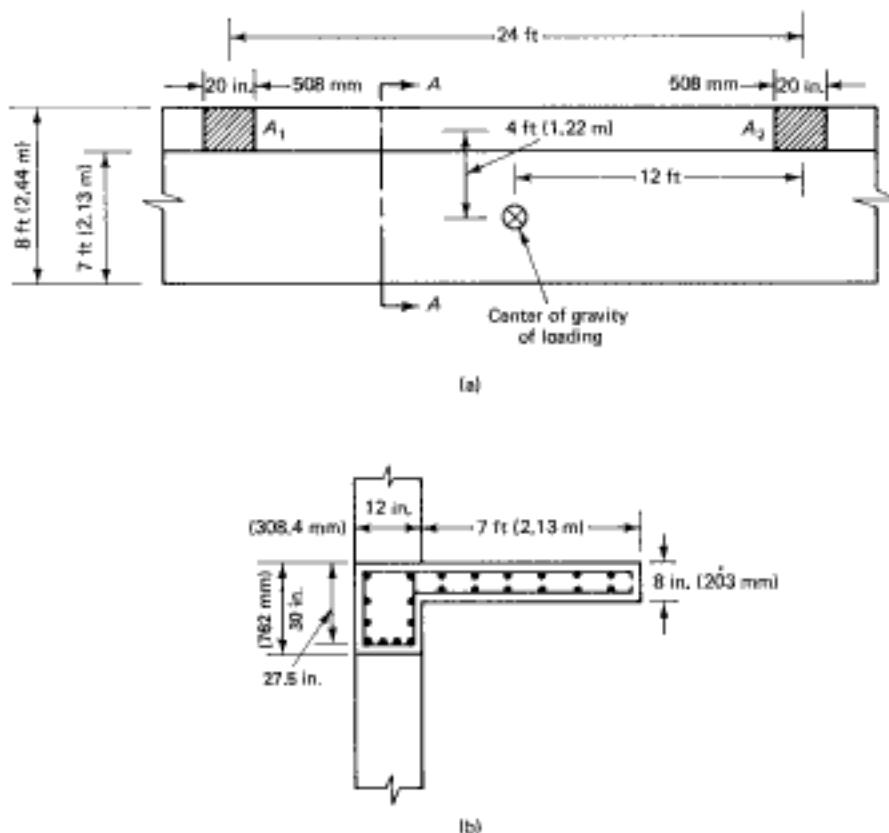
Plan and sectional elevation, Ex. 7.2: (a) plan; (b) section A–A.
